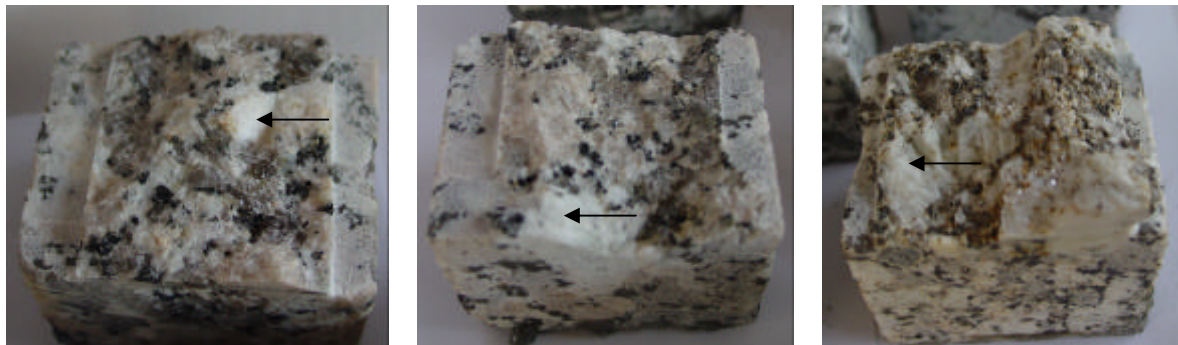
View of some fracture surfaces with identification of fracture cleavage of feldspar mineral
